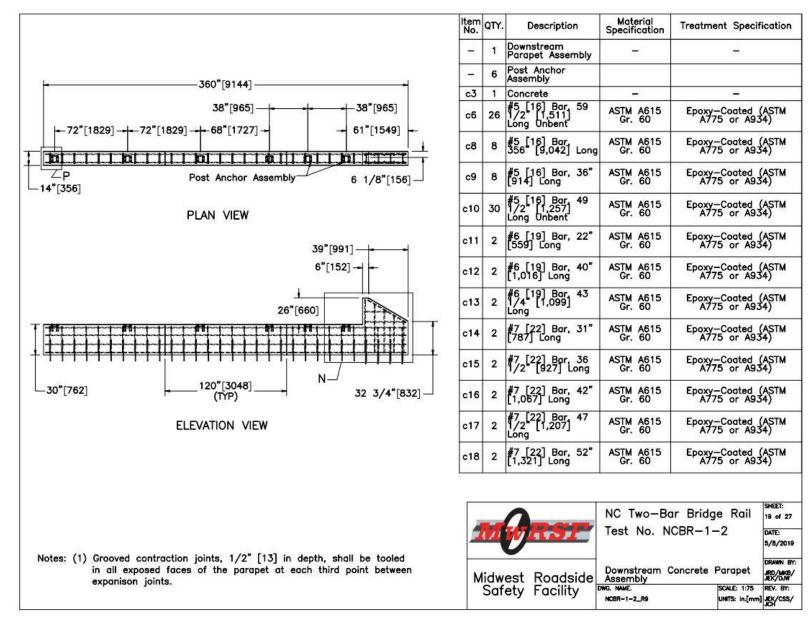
Downstream Concrete Parapet Assembly, Test Nos. NCBR-1 and NCBR-2
